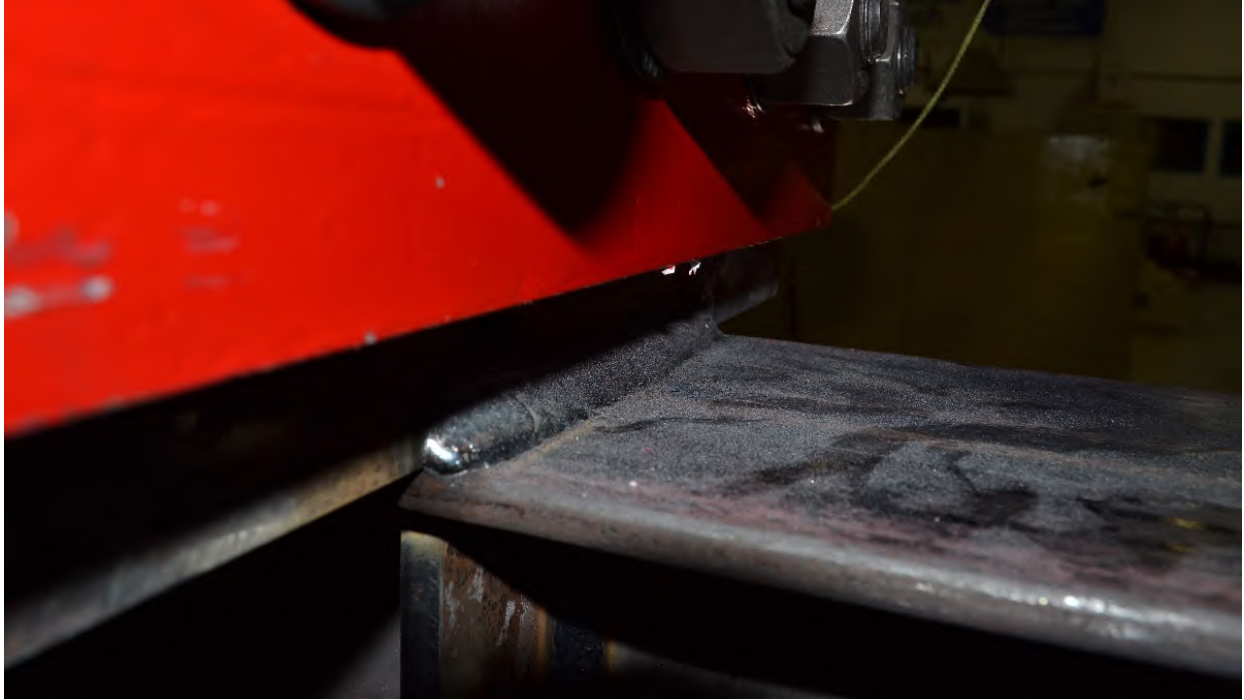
Top weld condition of W12X26-ST-E2 after testing
